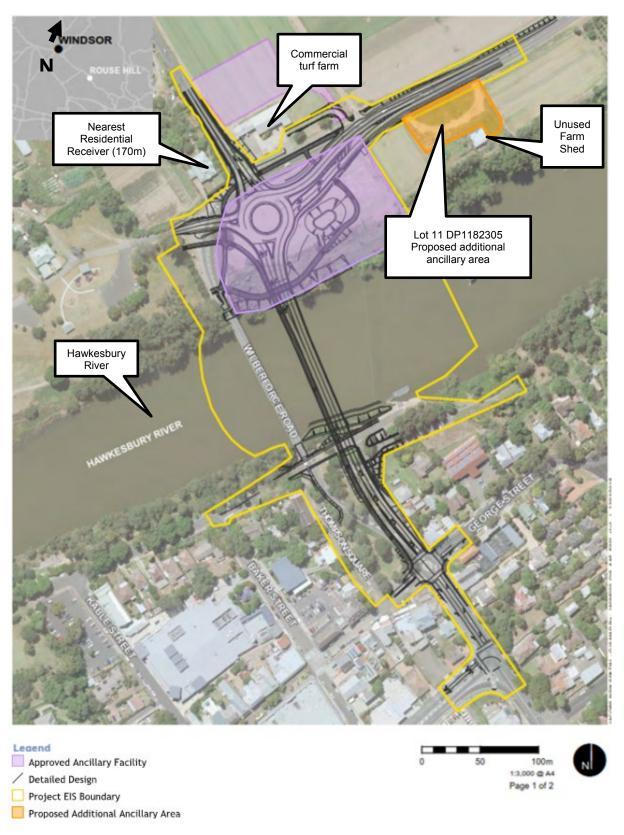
Proposed location of main ancillary facility adjacent to Wilberforce Road
